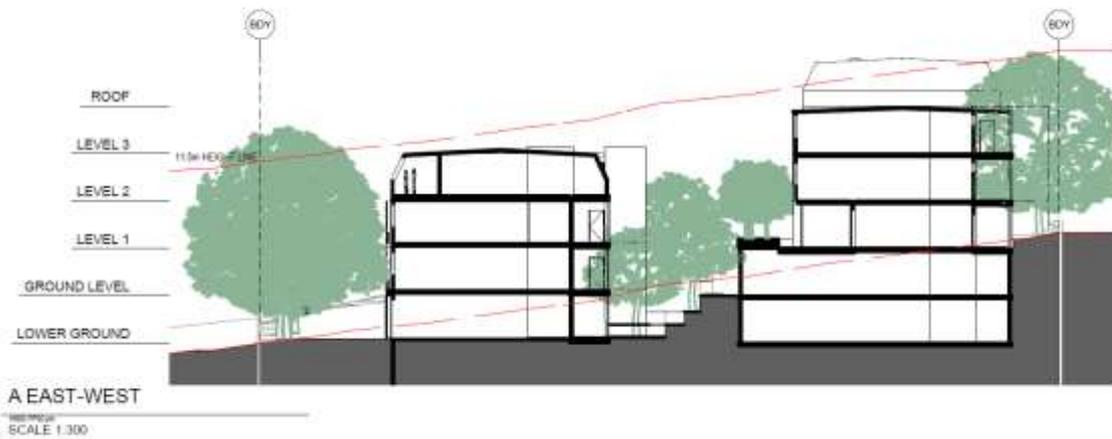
East-West Site Section (as submitted with Planning Proposal (Urbanlink plans p.15))
